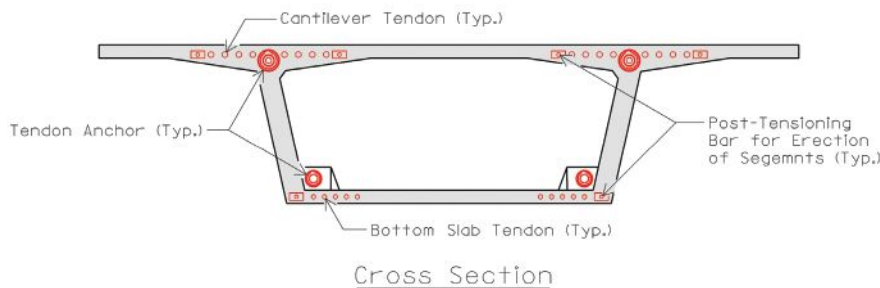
Typical cross section of post-tensioning layout for a constant-depth, balanced-cantilever bridge.
